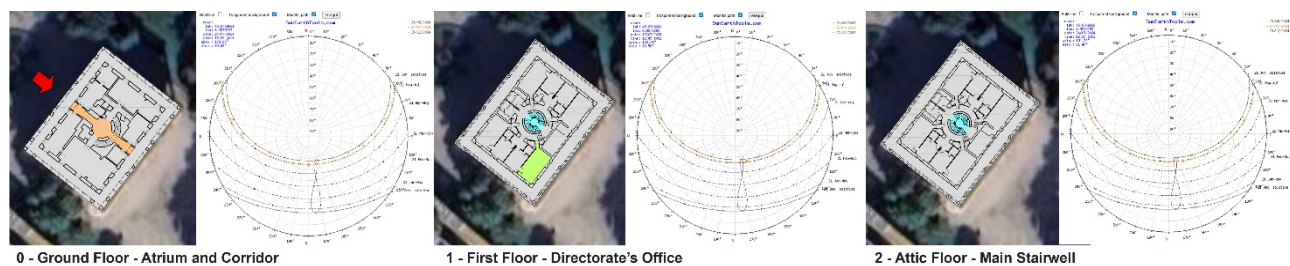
Orientation of openings on the ground floor and first floor concerning the North and corresponding solar diagram
